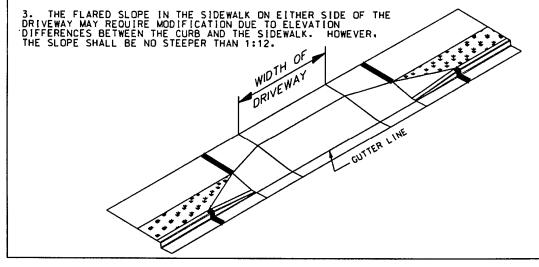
DETAIL OF DROP-CURB DRIVEWAY WHERE A GRASS PLOT OF LESS THAN 7'-43/4" (2.25 m) EXISTS
